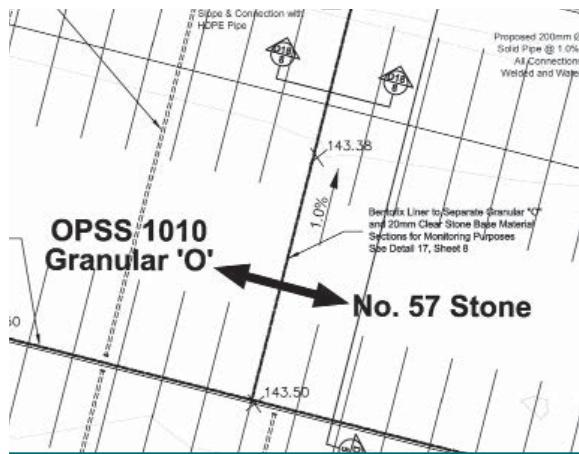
This construction plan used at the IMAX Project site shows a typical cross-section of permeable pavement. (Source: Aquafor Beech)
